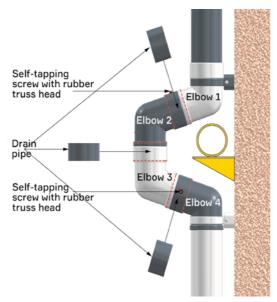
Bypassing the gas pipe or other protruding facade elements
